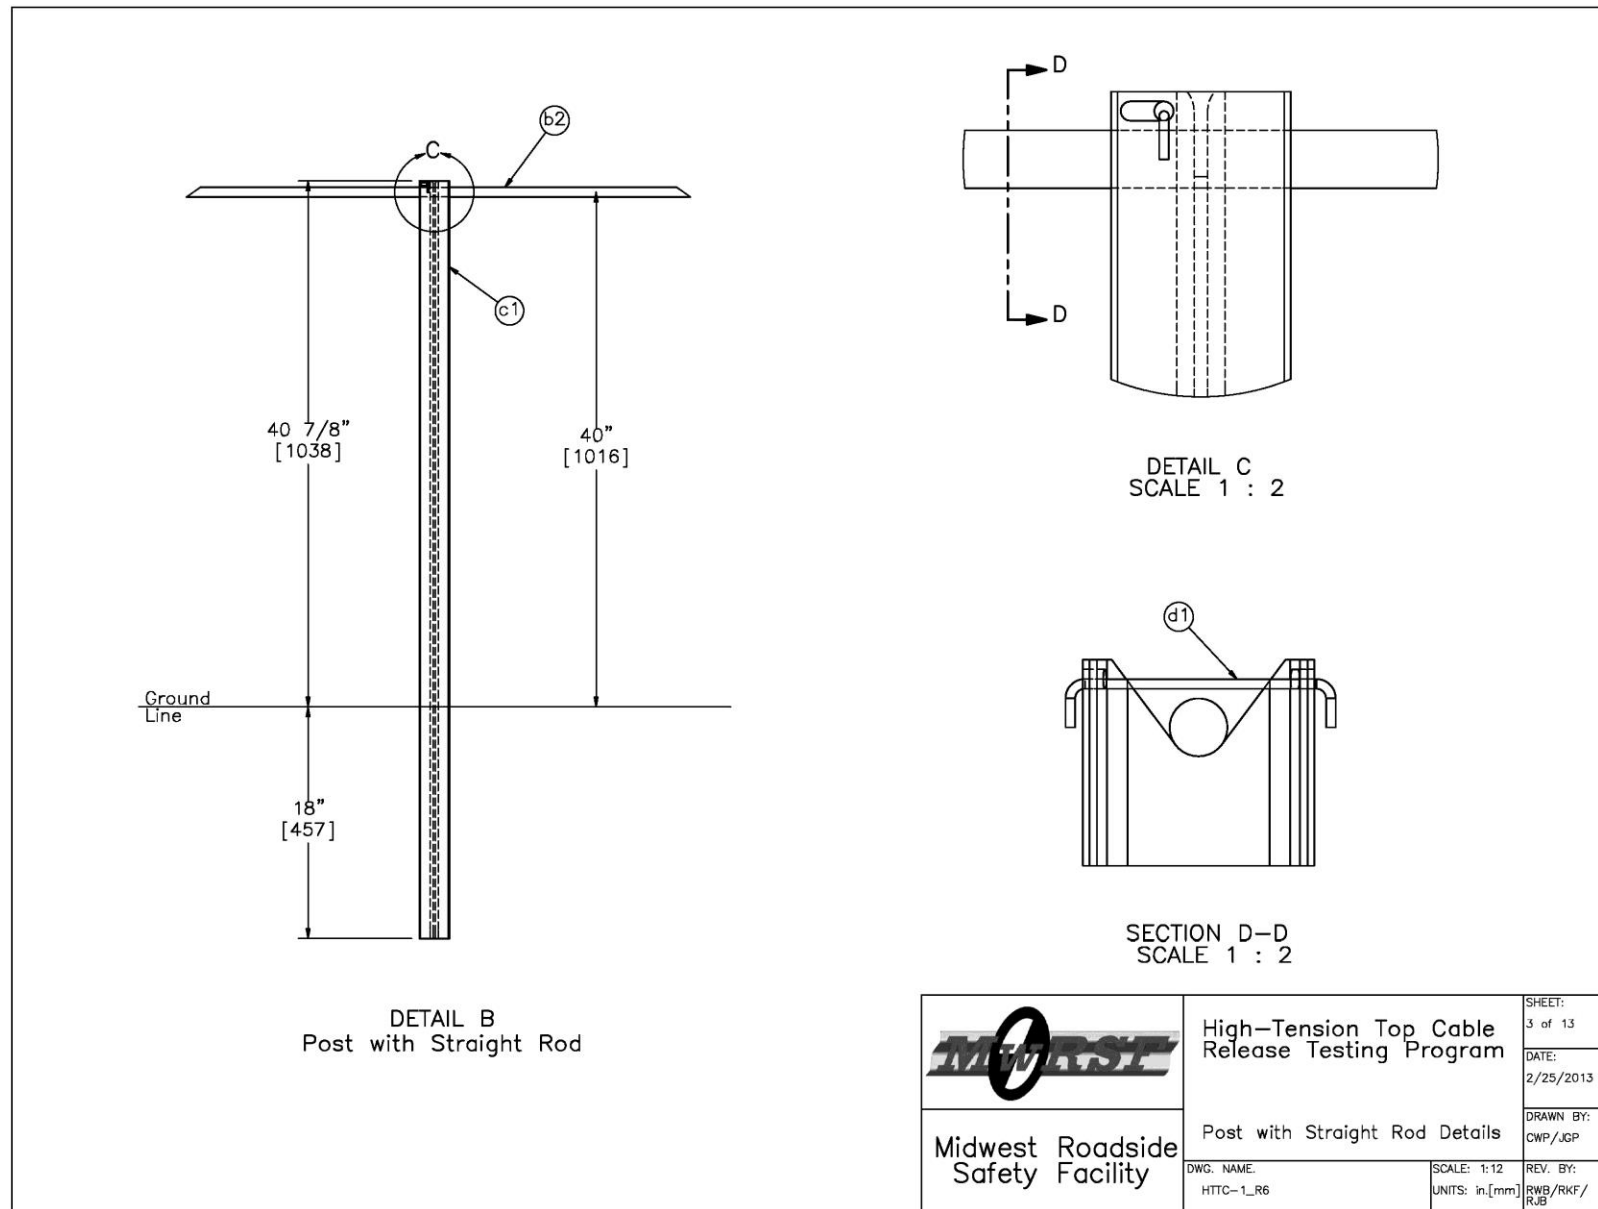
Post with Straight Rod Details, Test No. HTTC-1
